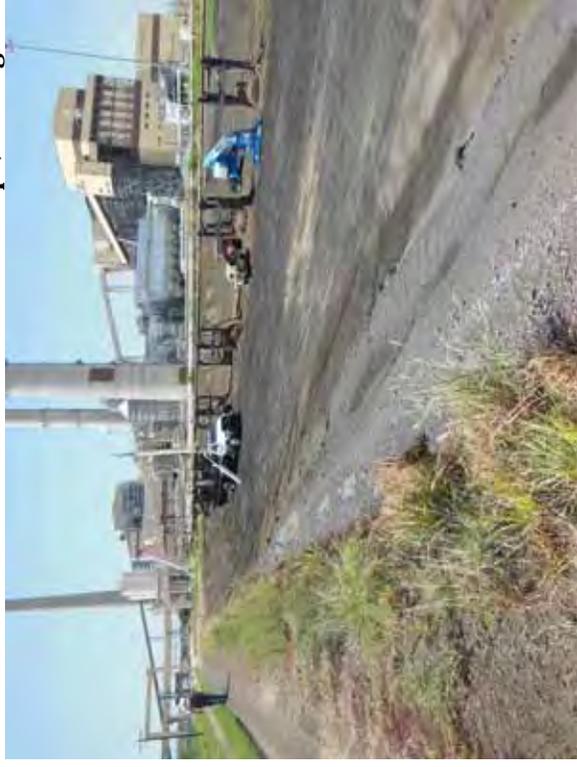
SP - South embankment exterior slope, looking west. Note equipment working in pond to replace inlet piping.
